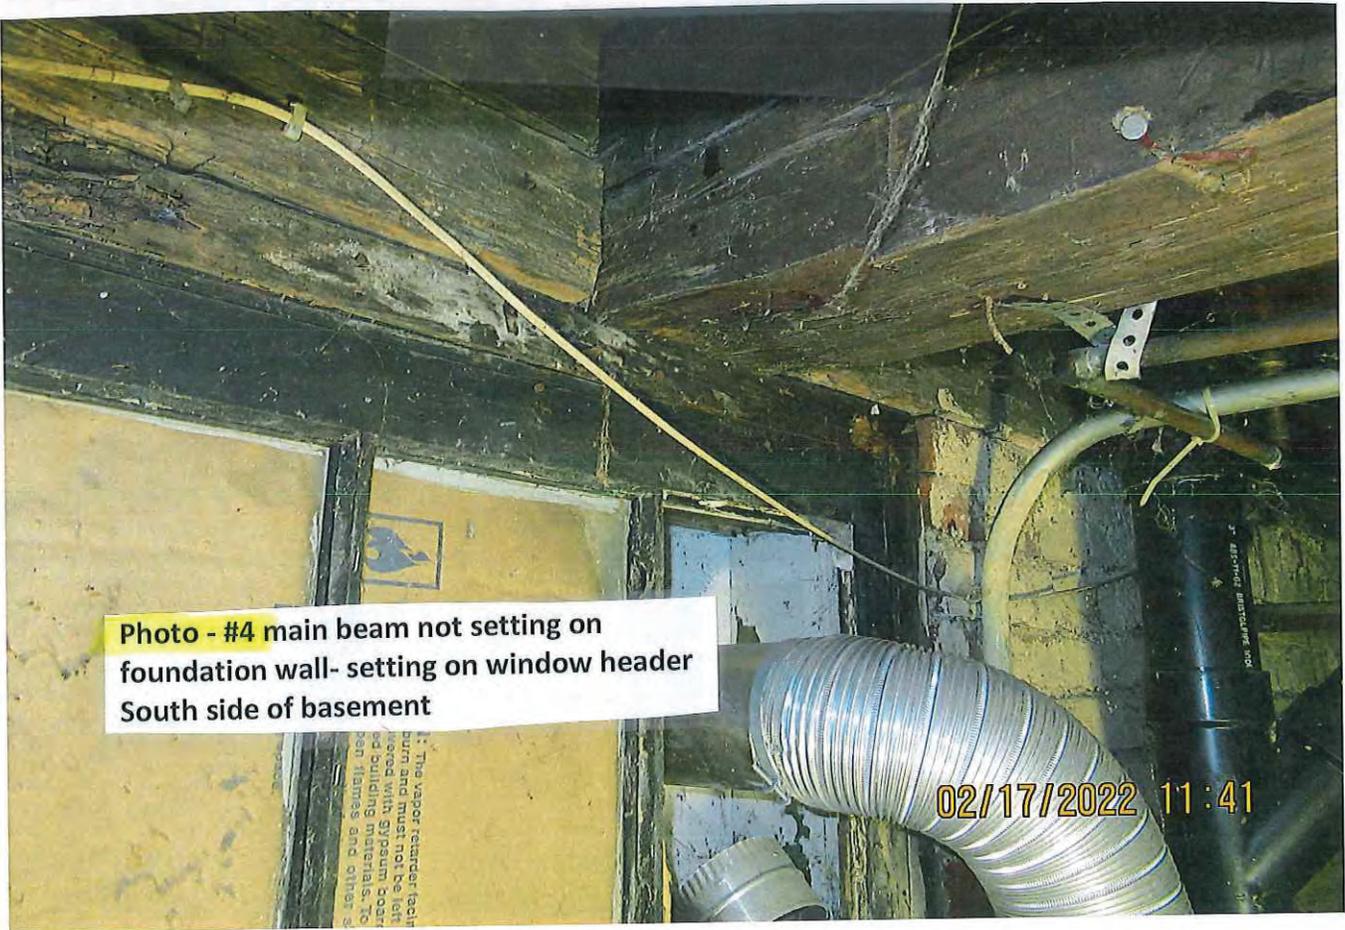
main beam not setting on foundation wall- setting on window header South side of basement
